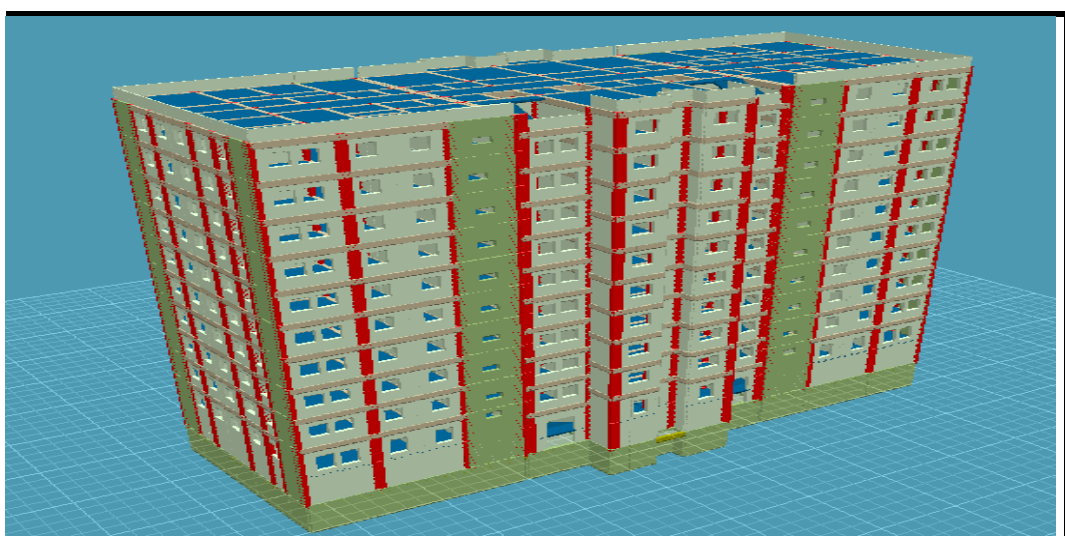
The 3D View of Buildings with Ten Stories and Stiffened Coupled Shear Wall System
